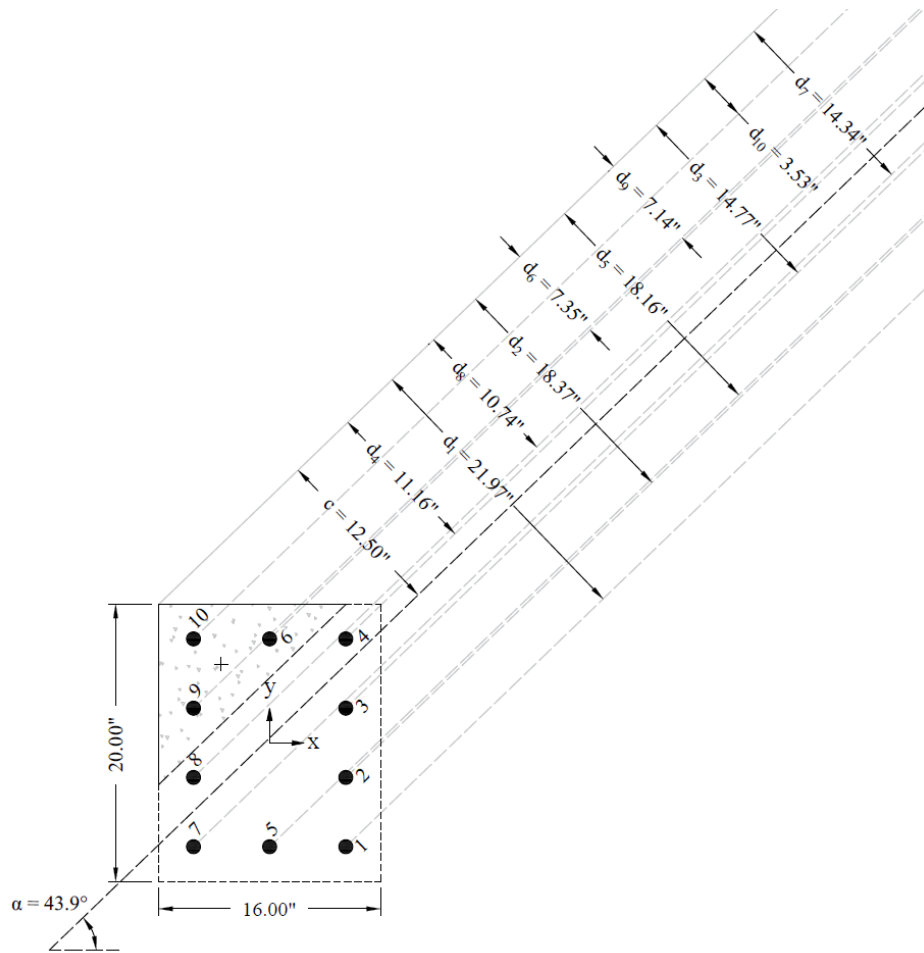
Reinforced Concrete Column Cross-Section and Reinforcement Locations
